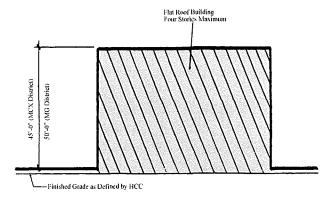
Building Height Roof Details (sloped or flat roof)
